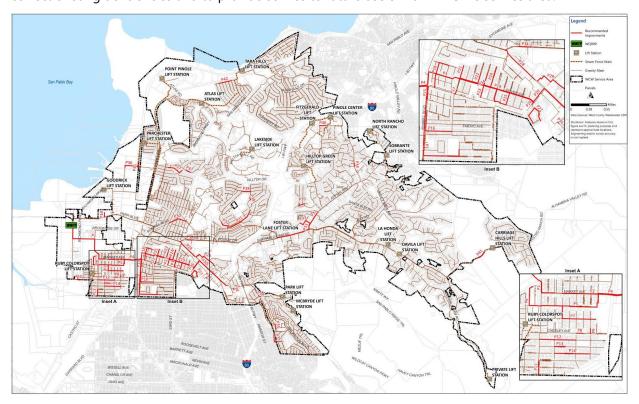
New Collection System Hydraulic Model Identified Proposed Sewer Improvements
